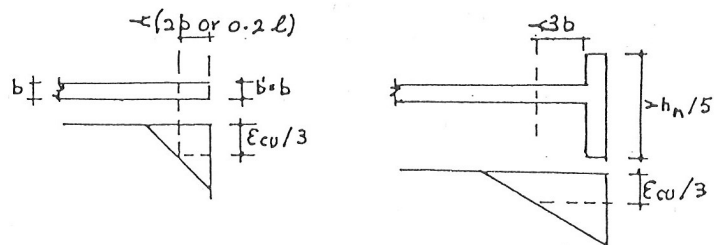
EXEMPTION FROM C1.5-5.1b ) ON MINIMUM WALL WIDTH
